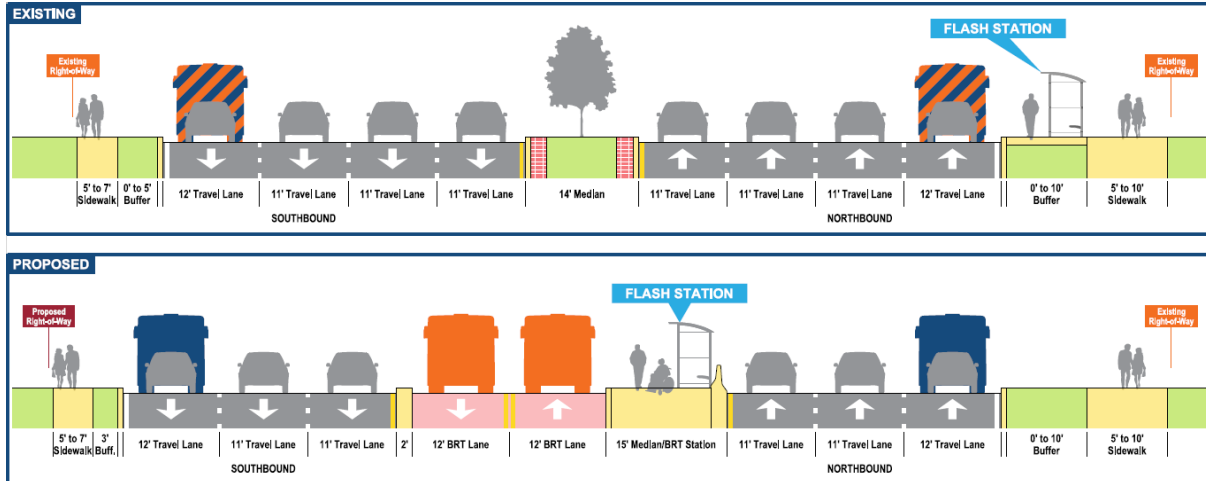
Existing and Proposed Cross-Section from I-495 to Timberwood Avenue
